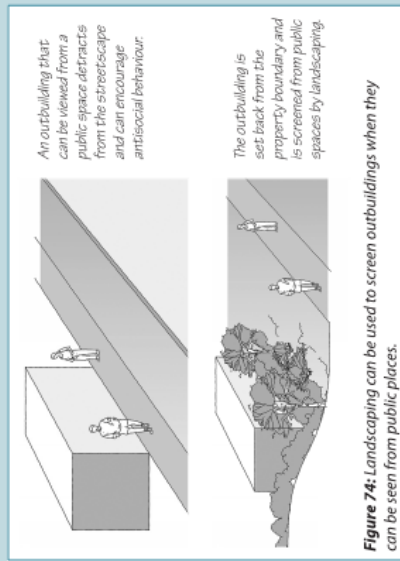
Landscaping can be used to screen outbuildings when they can be seen from public places.
